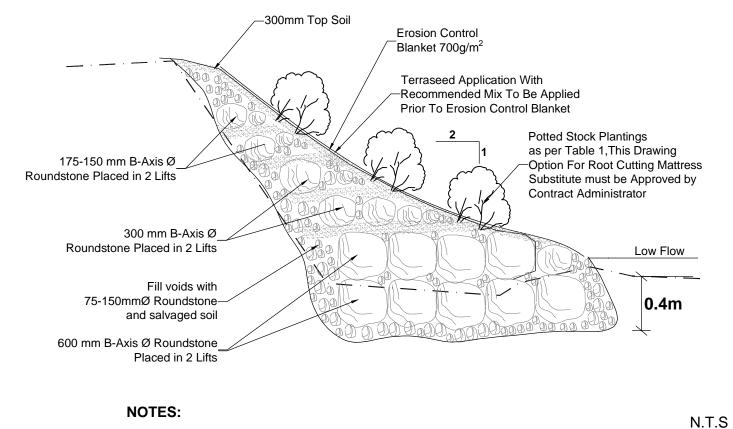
TYPICAL ARMOURSTONE WALL ALONG TRAIL
